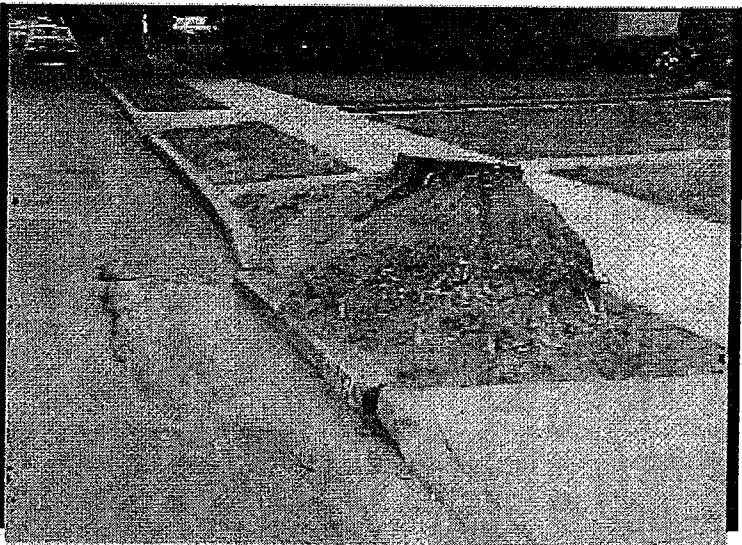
shows the damage done to the curb, gutter and street.
